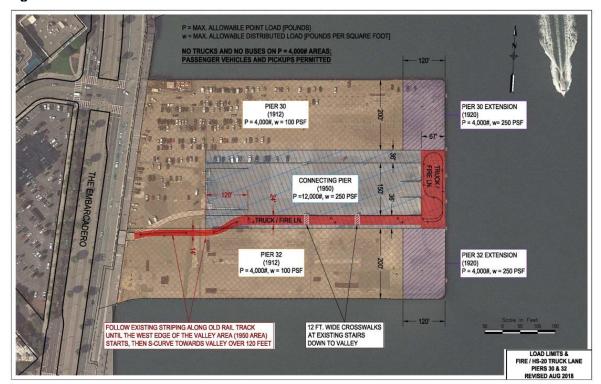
Piers 30-32 Site Plan and Load Restrictions
